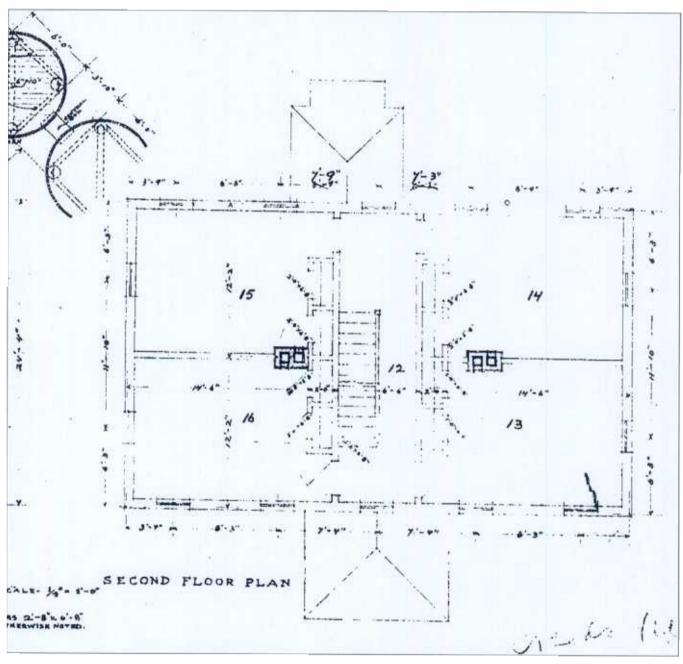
Original drawing of second-floor plan of station house (Source: Coast Guard Academy Library)
